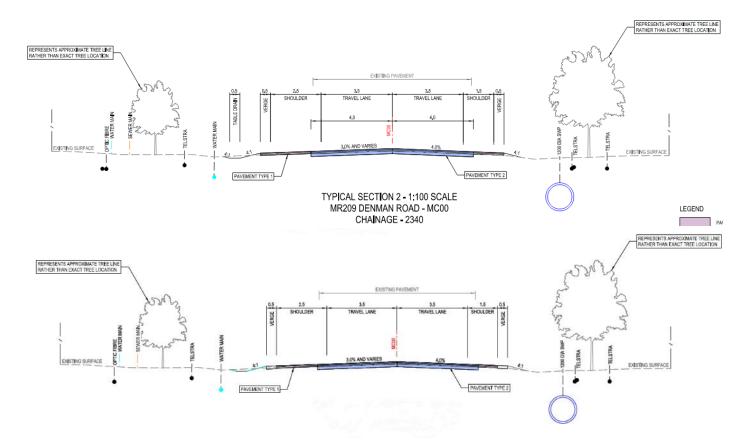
Typical cross section (detailed design) – about 200 metres south of Racecourse Drive
